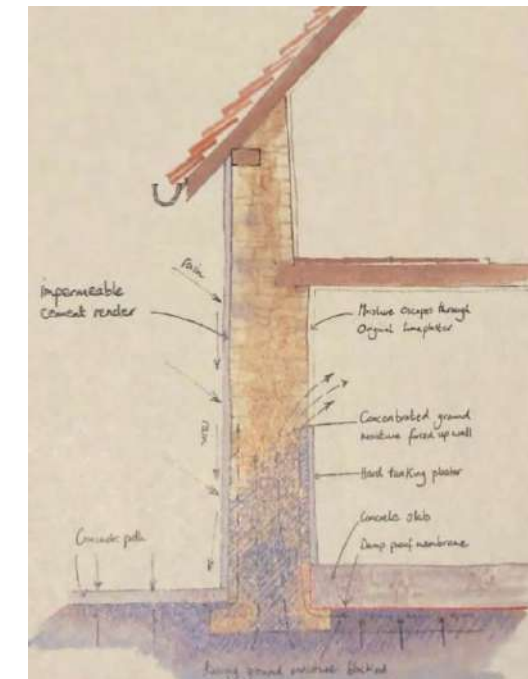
Impact of modern materials on Traditional Construction: impermeable pointing outside, hard ground outside, hard plaster inside (in part), wall is saturated and cannot dry out. Excess moisture in wall evaporates through the soft part only, the remaining lime plaster.
